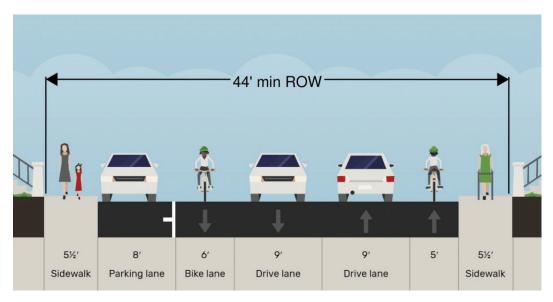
Front Ave Proposed Cross Section – Option 2
